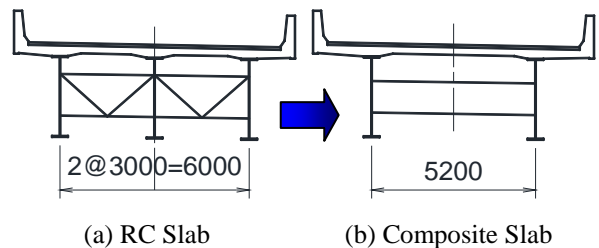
Difference of Girder Alignment per Slab Type
